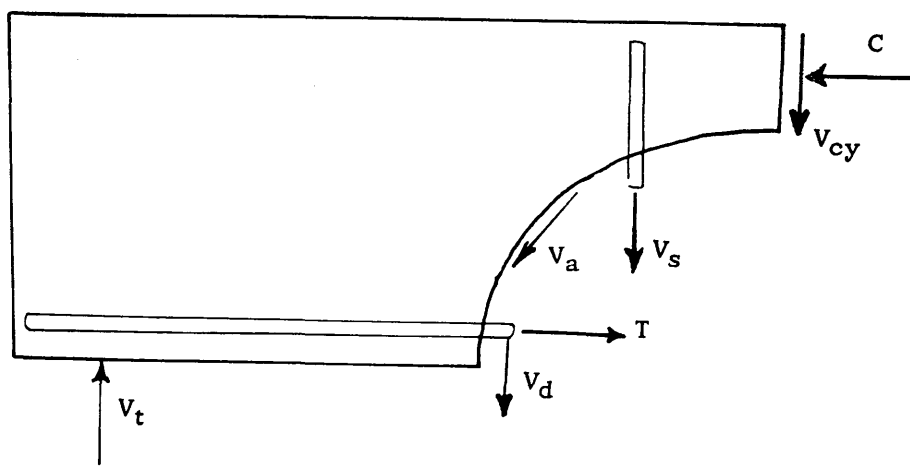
FORCES ACTING AT INCLINED CRACK FOR BEAMS WITH WEB REINFORCEMENT
